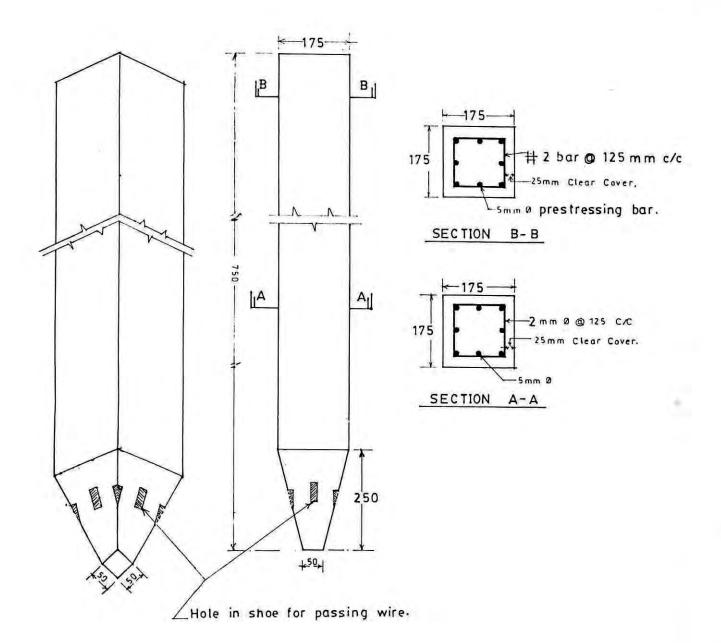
Typical section of 175 x 175 size prestressed pile.
